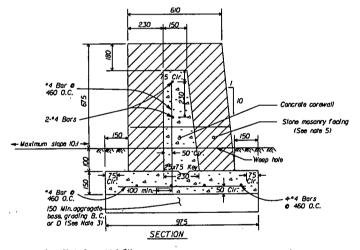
Schematic of stone masonry guardwall (after (126)).
